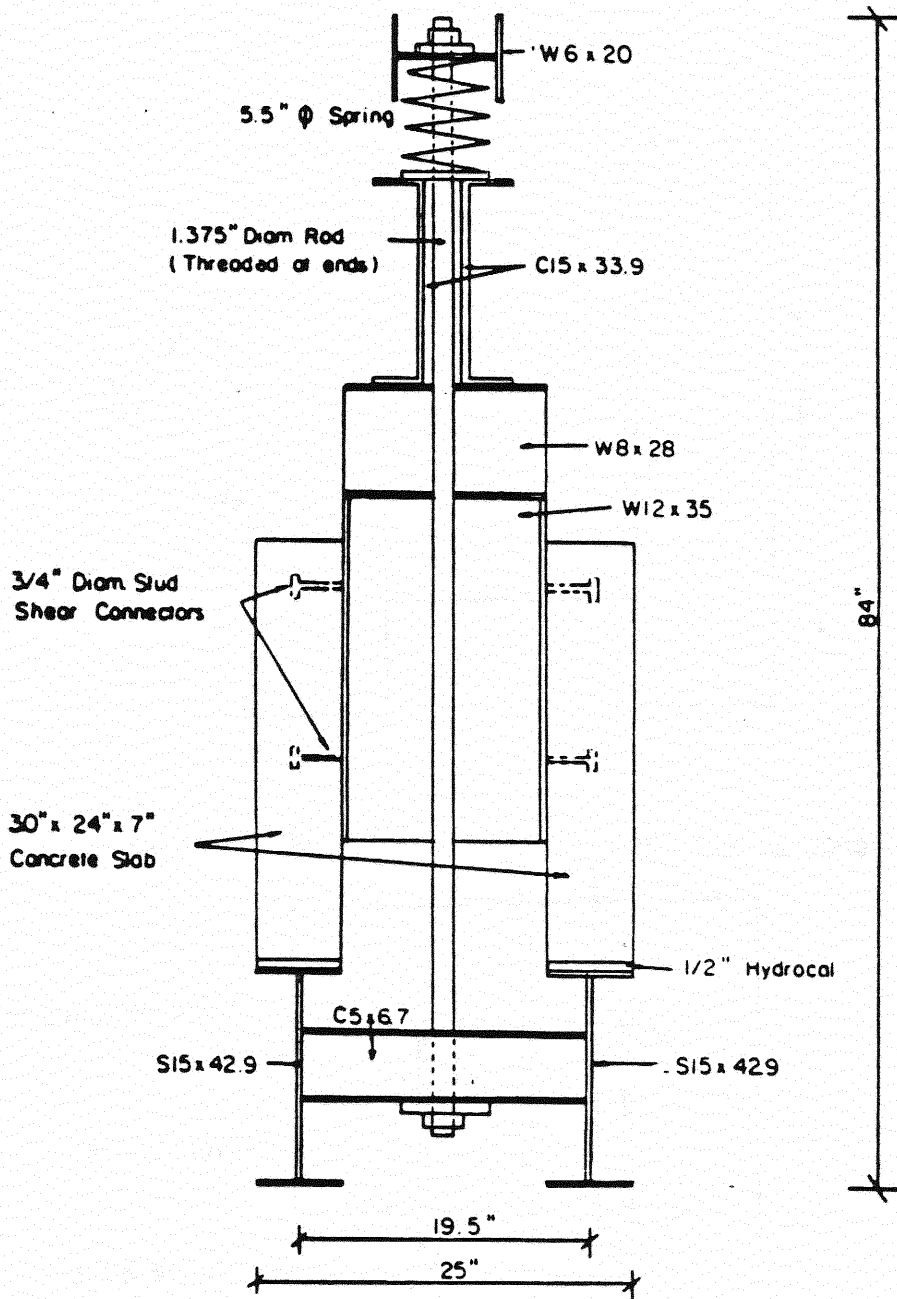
Side View of Shear Connector Specimen Sustained Loading Test Setup
